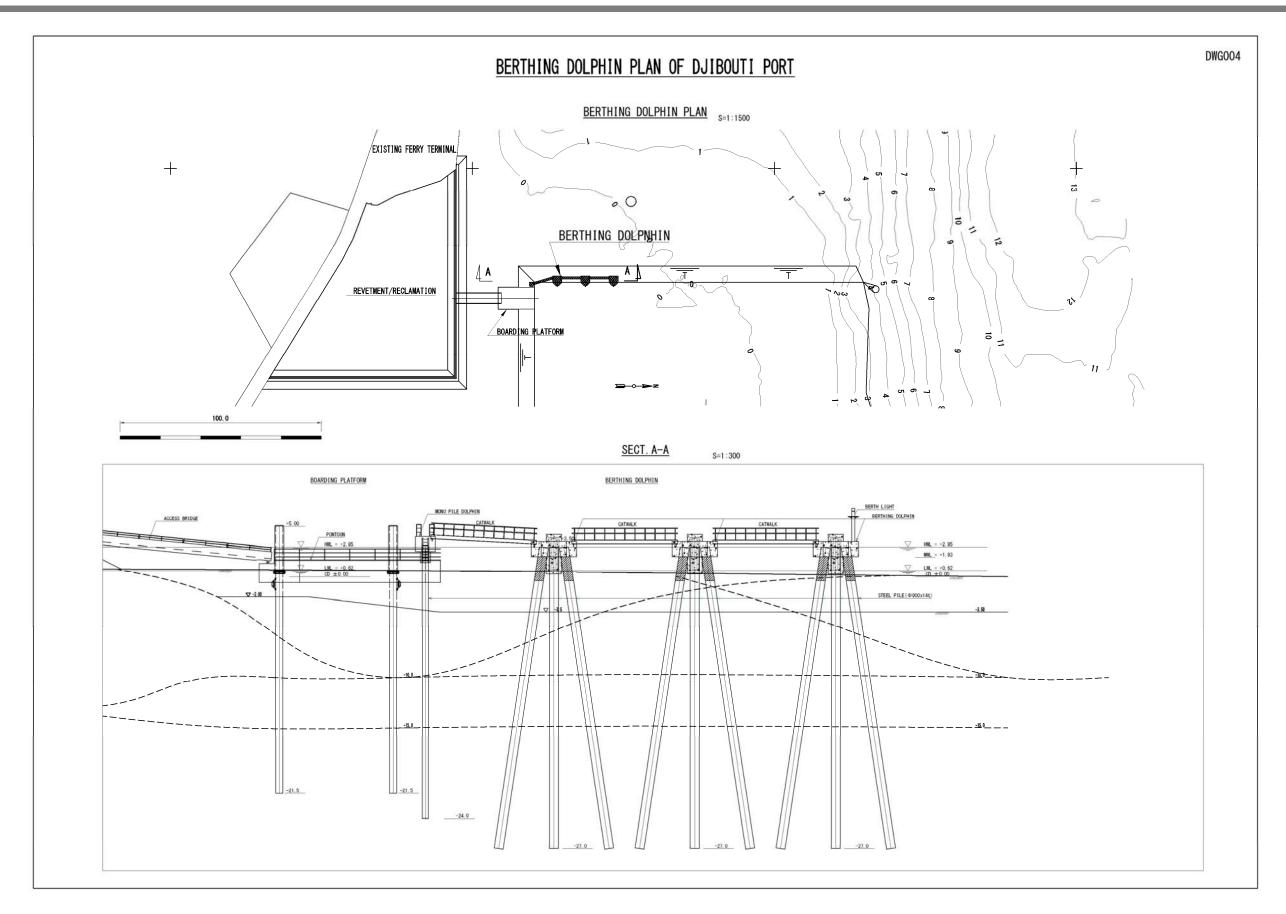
Berthing Dolphin Plan of Djibouti Port
